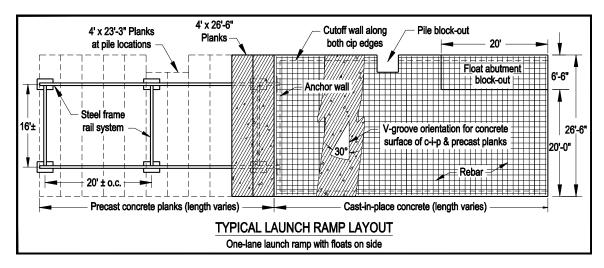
Launch ramp layout showing rebar, rails, and block-outs
